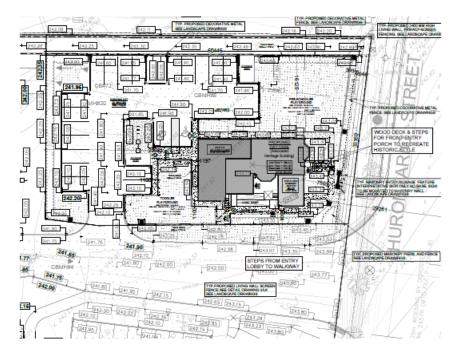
Site Plan, Phase 2 Armstrong House Daycare (AREA, Aug. 20, 2024)
